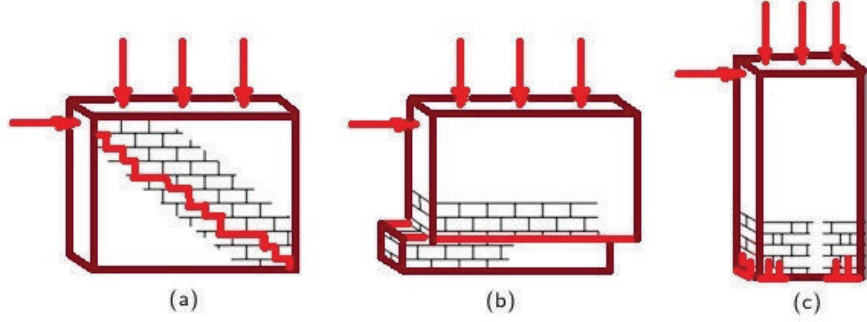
Failure modes for masonry walls subjected to in-plane loads (a) diagonal tensile failure (b) sliding shear failure (c) bending failure (crushing of masonry) [96]
